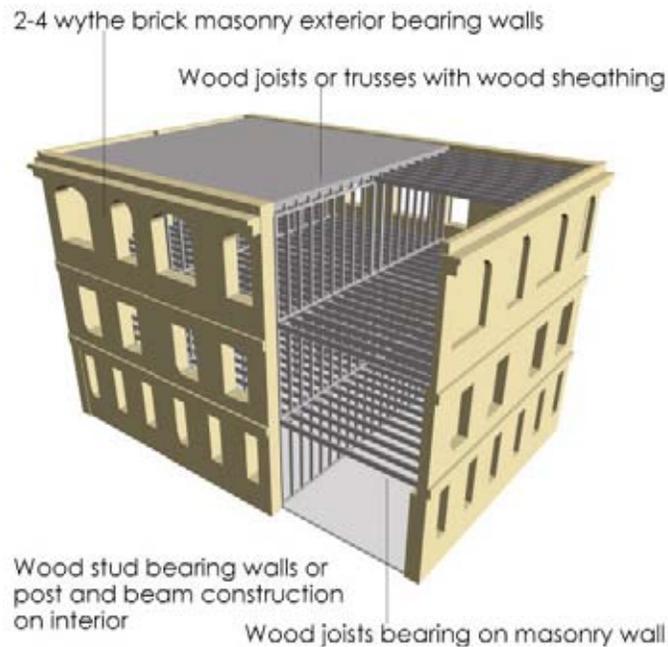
Building Type URM: Unreinforced Masonry Bearing Walls
